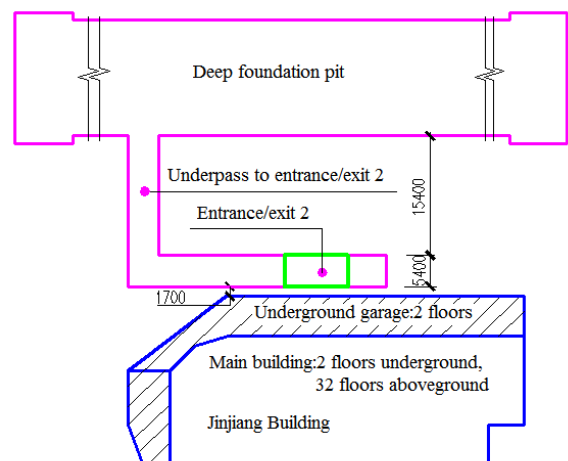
Relative positions of between the building and the deep foundation pit of the station
